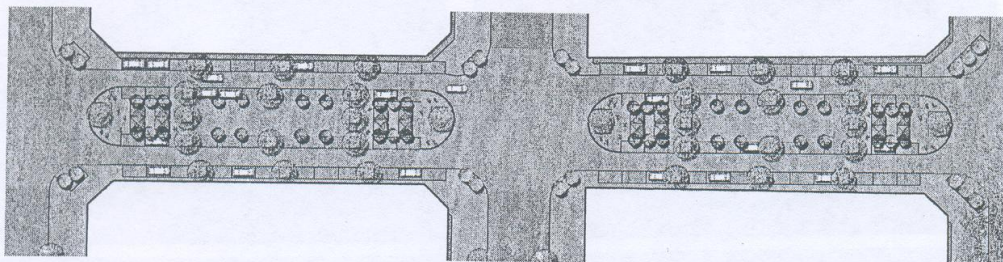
Proposed Detail Area of Cultural Enclave Halaman Pasar Street
